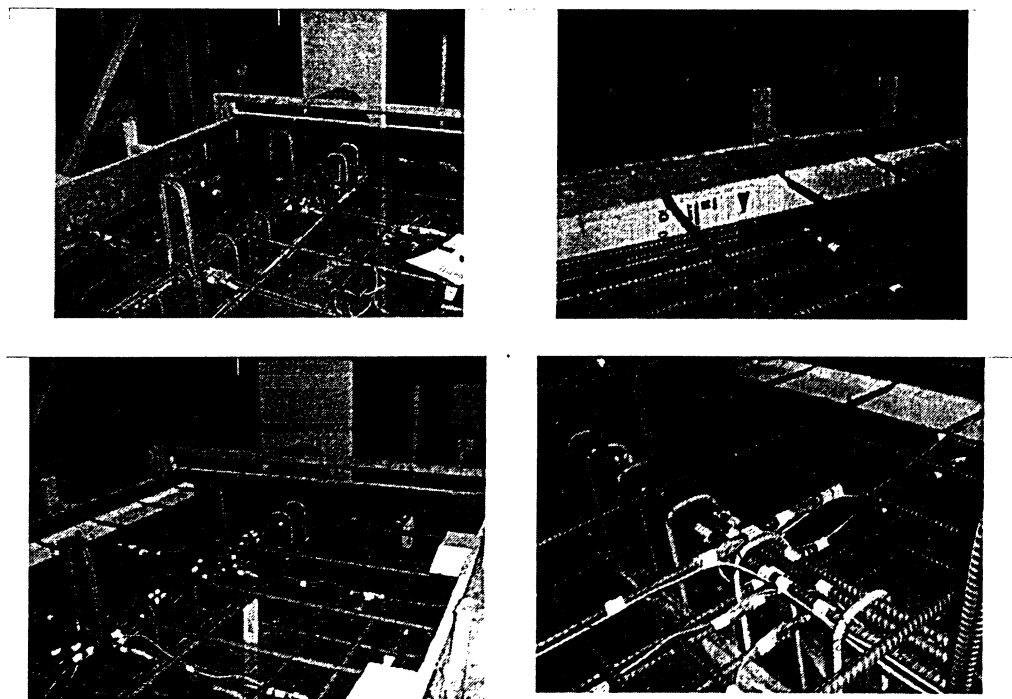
Slab and Girder Reinforcement for Models M2 and M4
